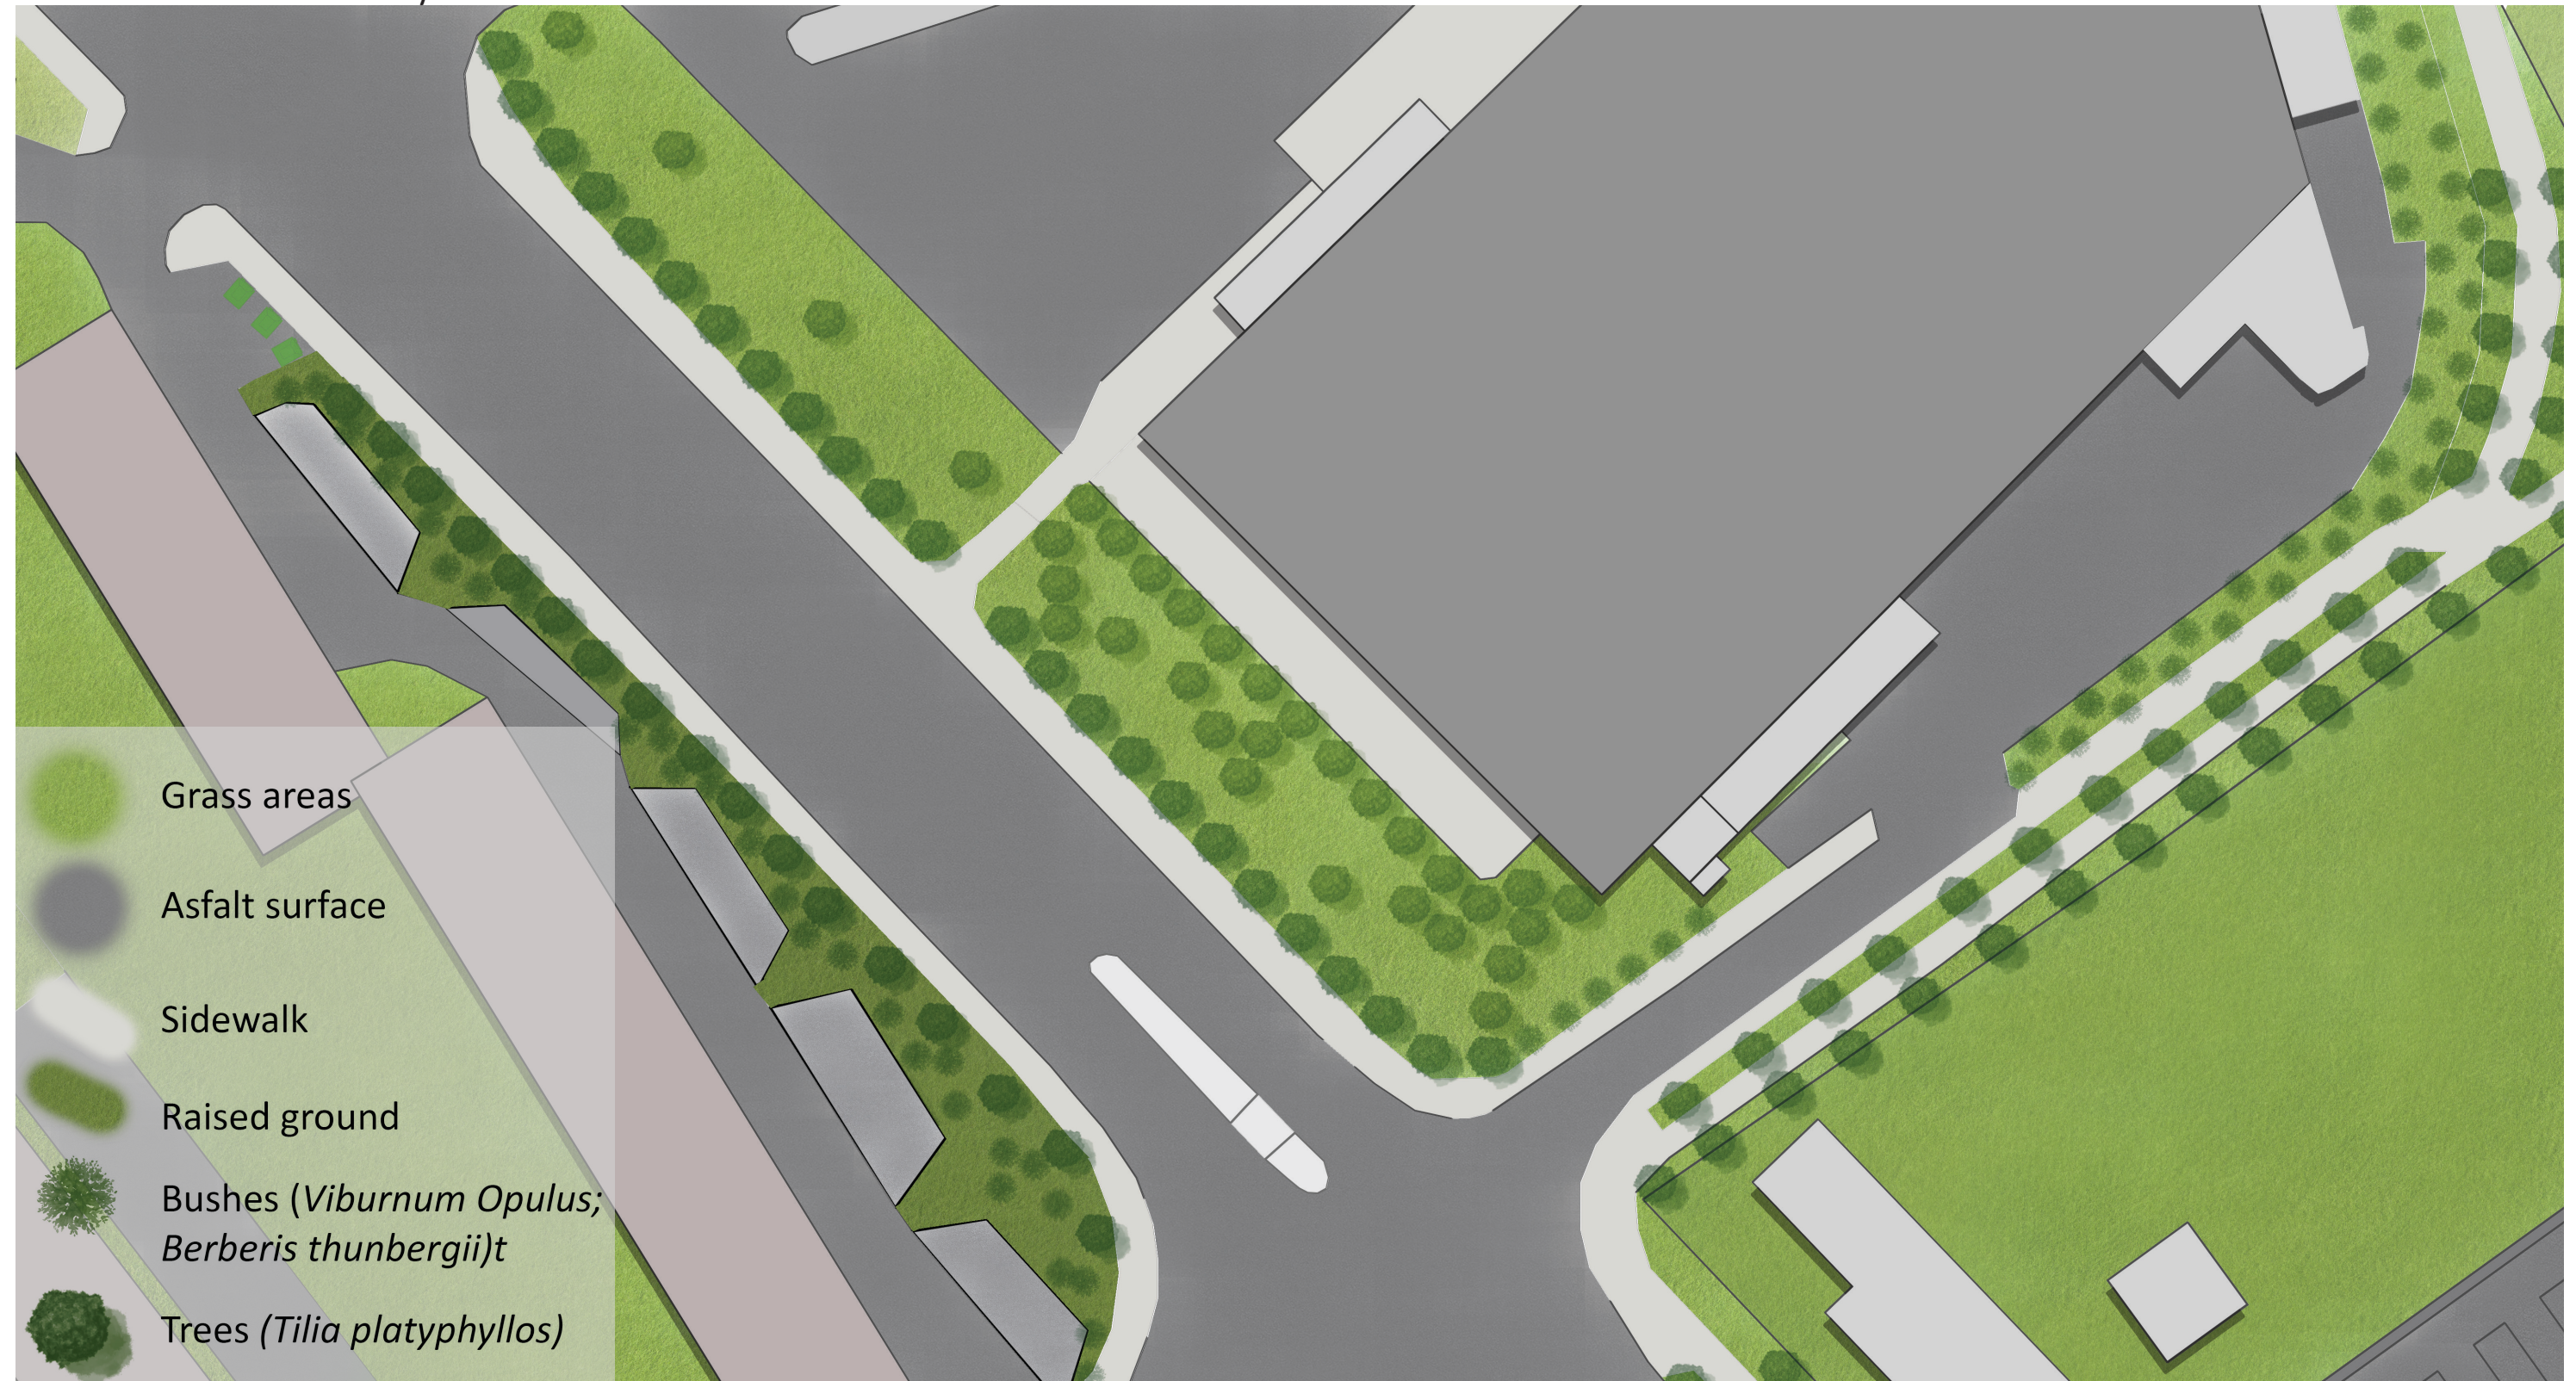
Design plan to show apartment area and the connection behind the Zeppelin. (Design plan 1:500)
